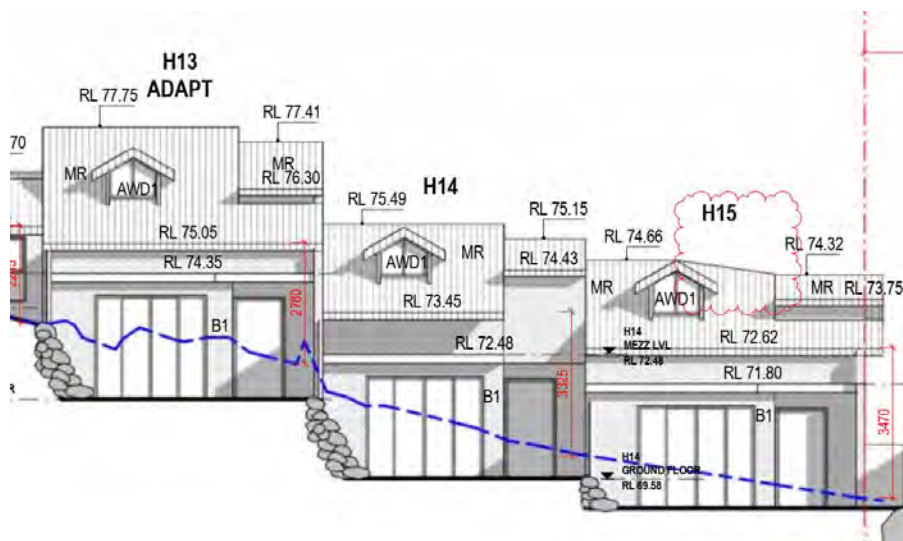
Extract of West Elevation showing the roof levels of Dwellings H13 – H15.
